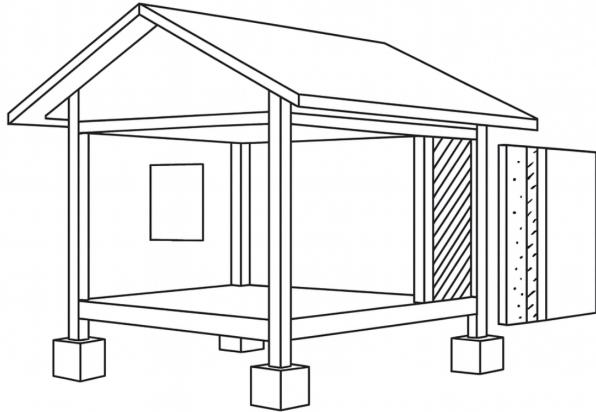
Conceptual schematic of the elevated foundation, modular frame, and layered wall system.
